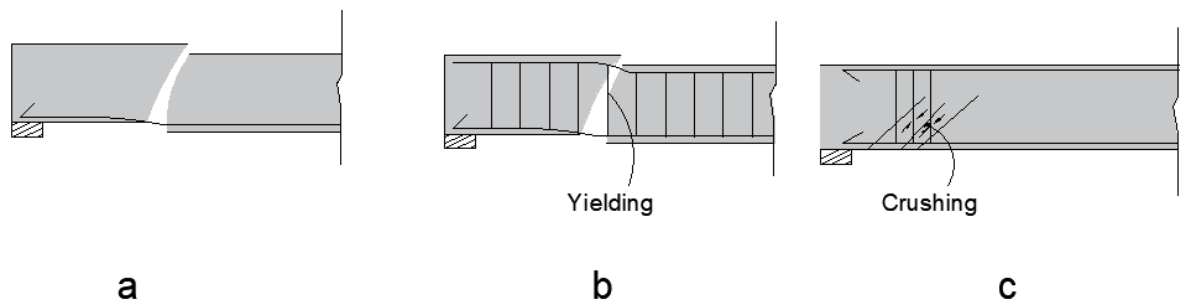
Types of shear failure in a reinforced concrete member a) shear sliding failure in a member without shear reinforcement b) shear sliding failure after yielding of shear reinforcement c) crushing concrete due to web shear compression failure. Based on Engström (2011b).
